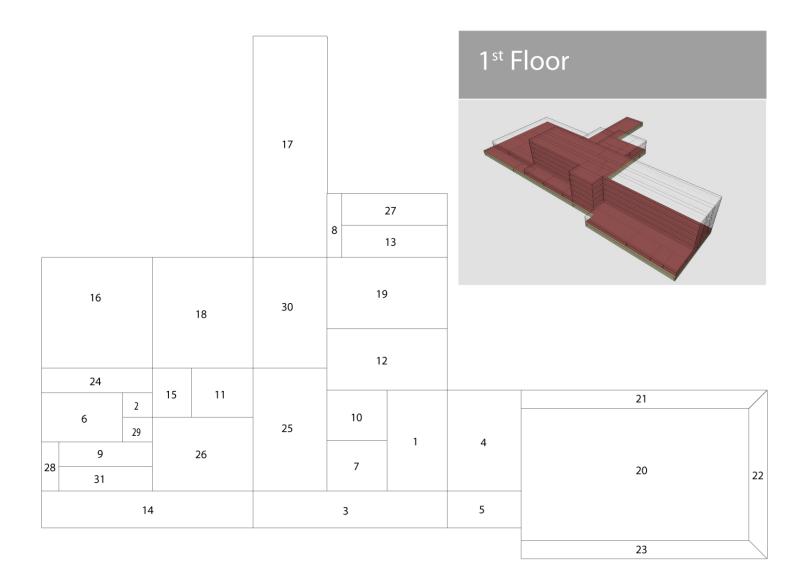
Large hospital zone layout – floor 1 (Credit: Marjorie Schott/NREL)
